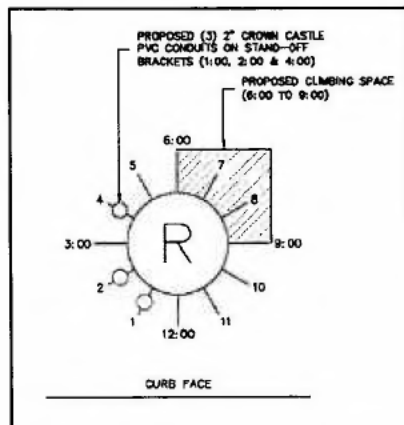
Inverted pole configuration (Source: Plans A-1 Panel 3).
